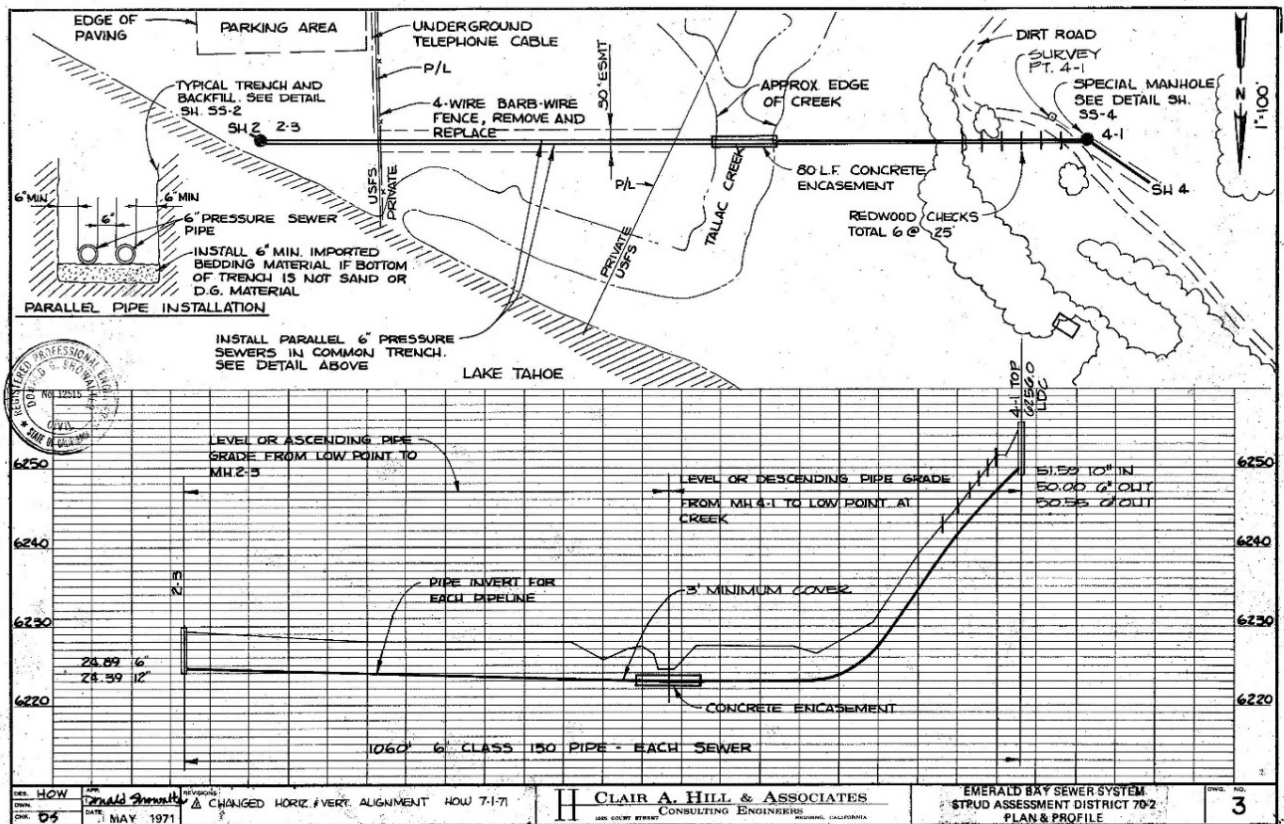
As-built construction plan and profile of the Tallac Creek sewer pipeline crossing. Elevations shown are based on the National Geodetic Vertical Datum of 1929 (NGVD 29).
